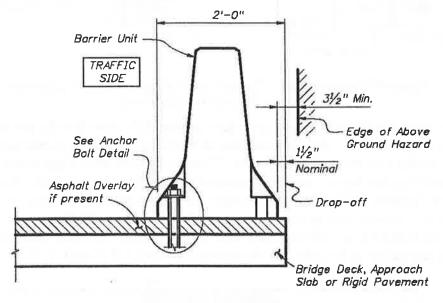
Florida's minimum clearance to bridge deck drop-off Source: FL DOT 414 Sheet 5
